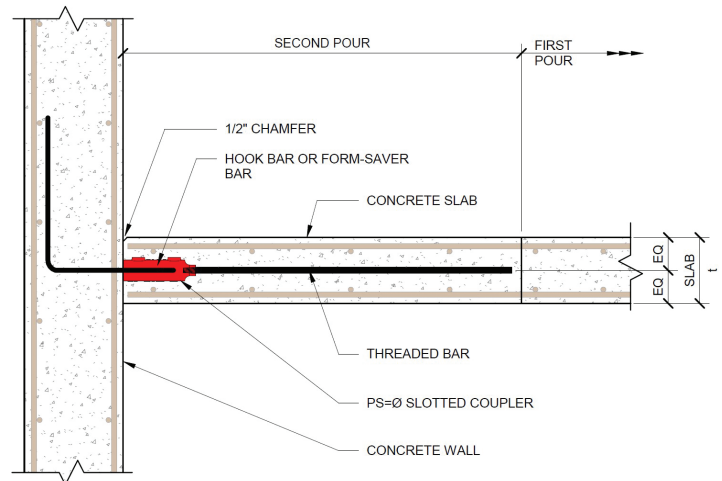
PS=Ø slab-to-wall restraint relief joint with temporary stressing strip
